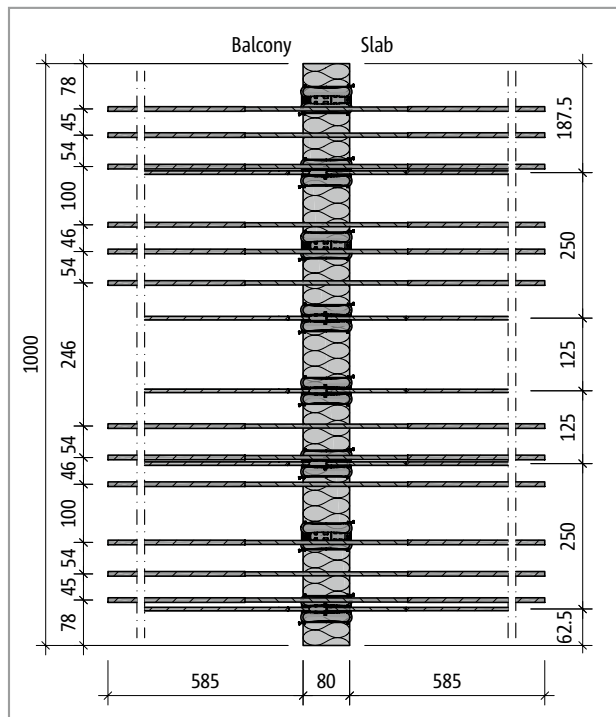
Schöck Isokorb® T type K-M4-V1: Product layout
